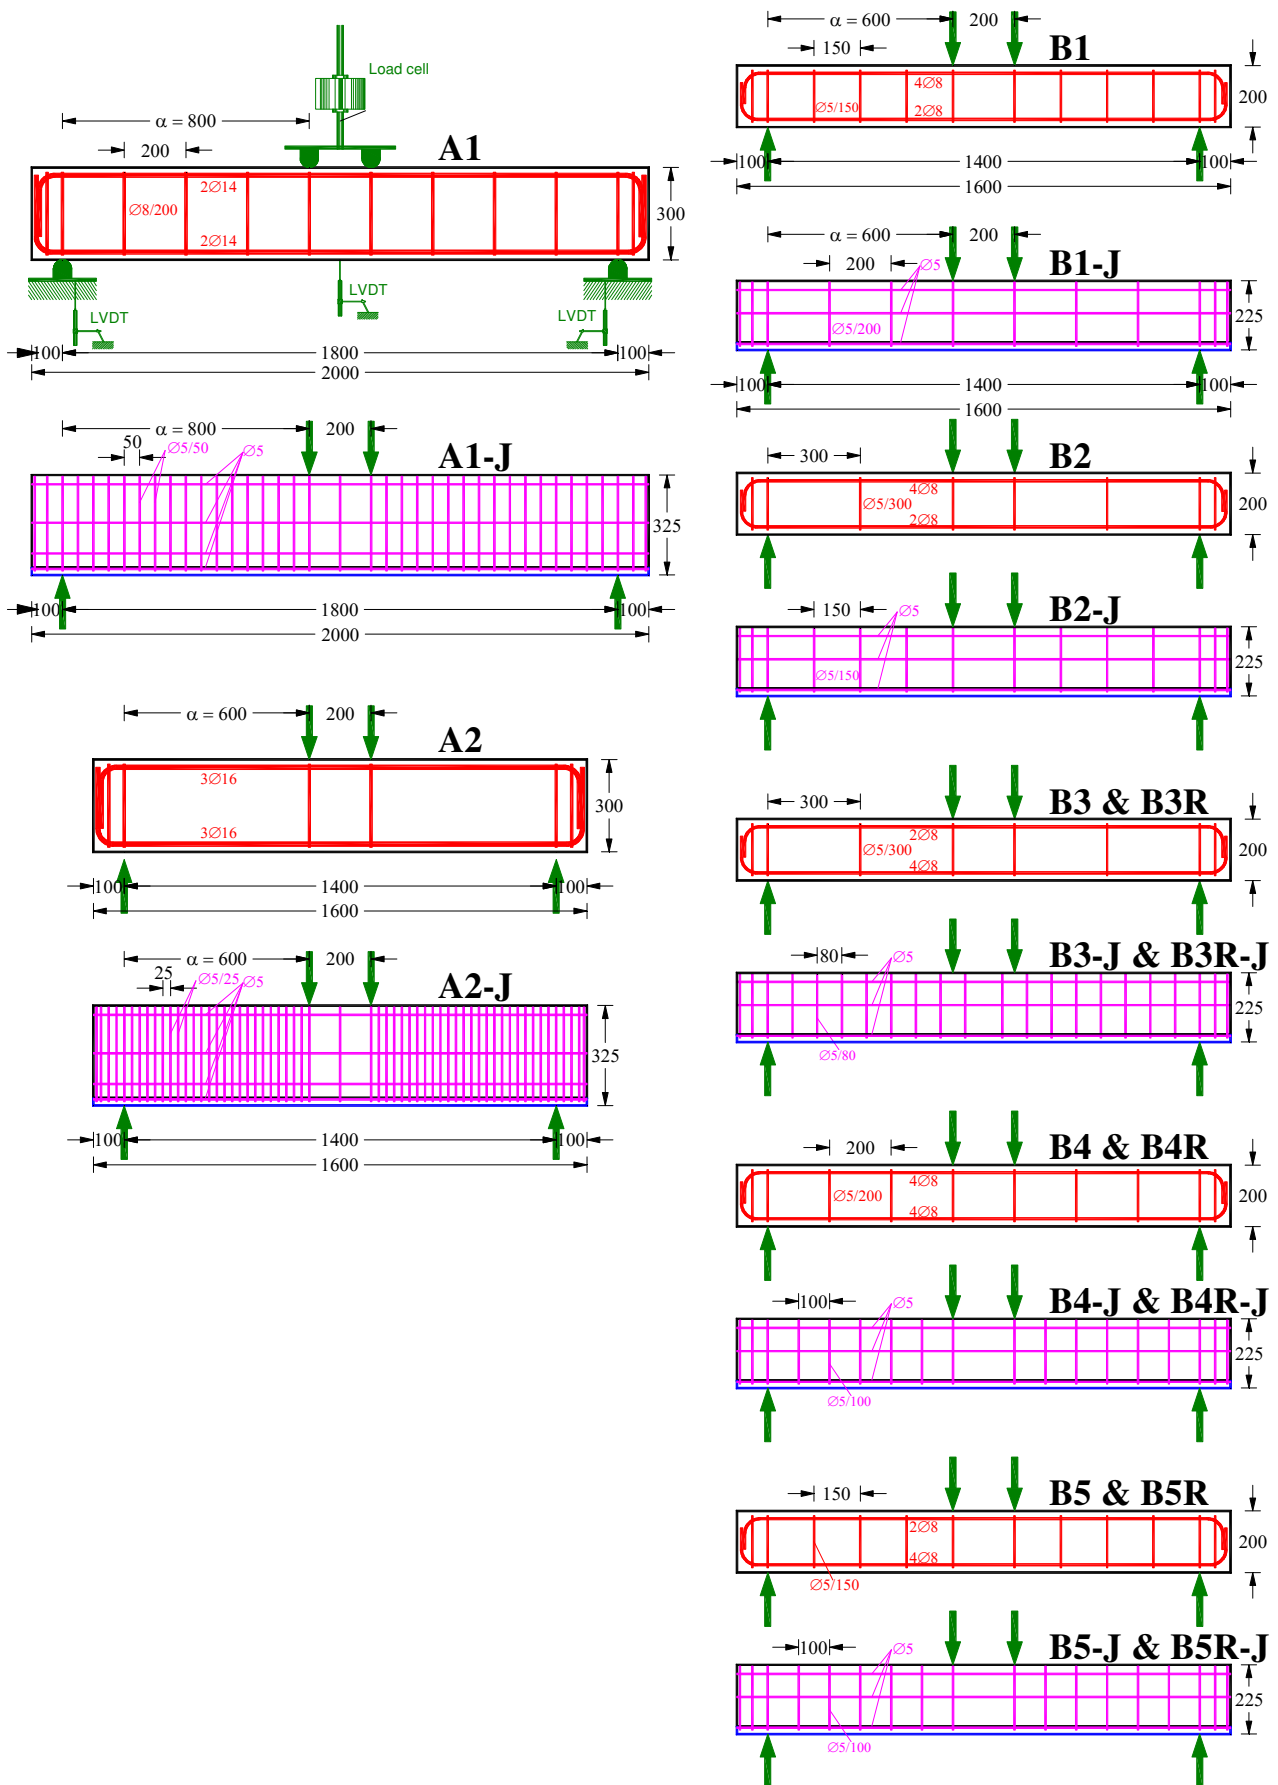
(a) Geometry, test setup and steel reinforcement arrangement of the tested beams.
